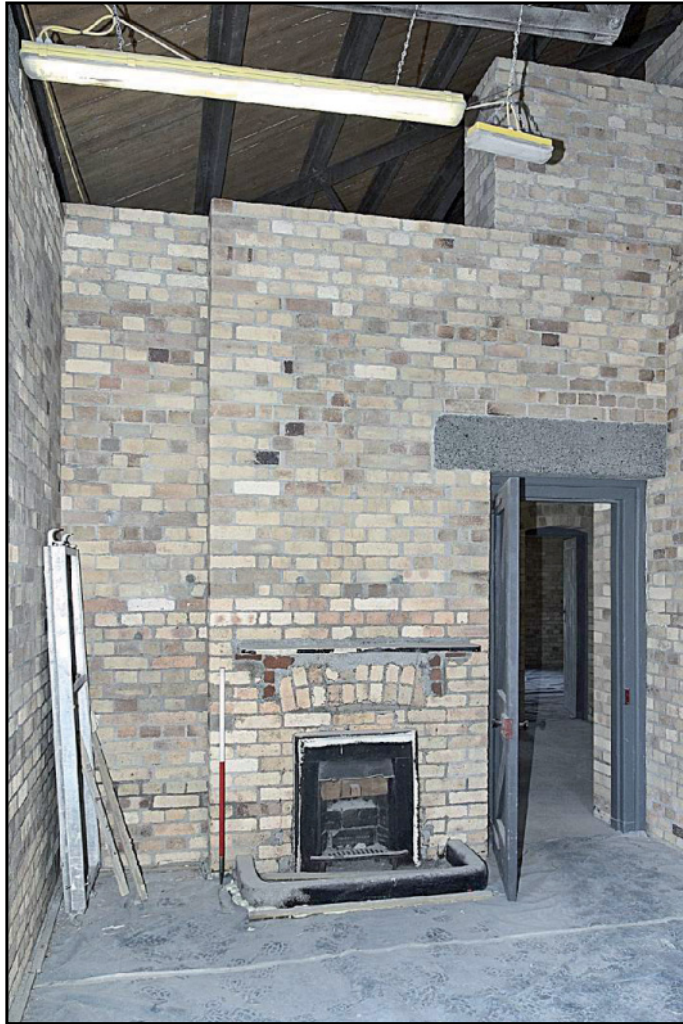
Room F1, showing the fireplace and door, looking east. 1m scale.
